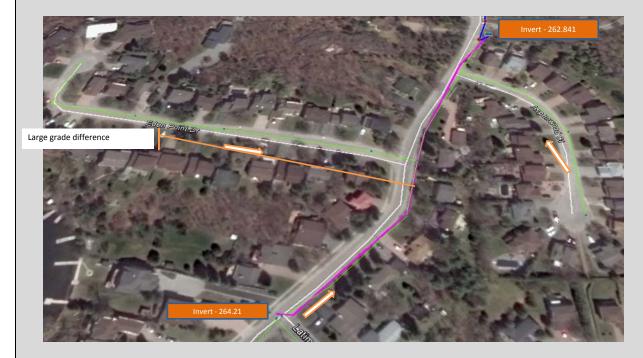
Manhole location, invert, and forcemain locations surrounding Loach's Lift Station
